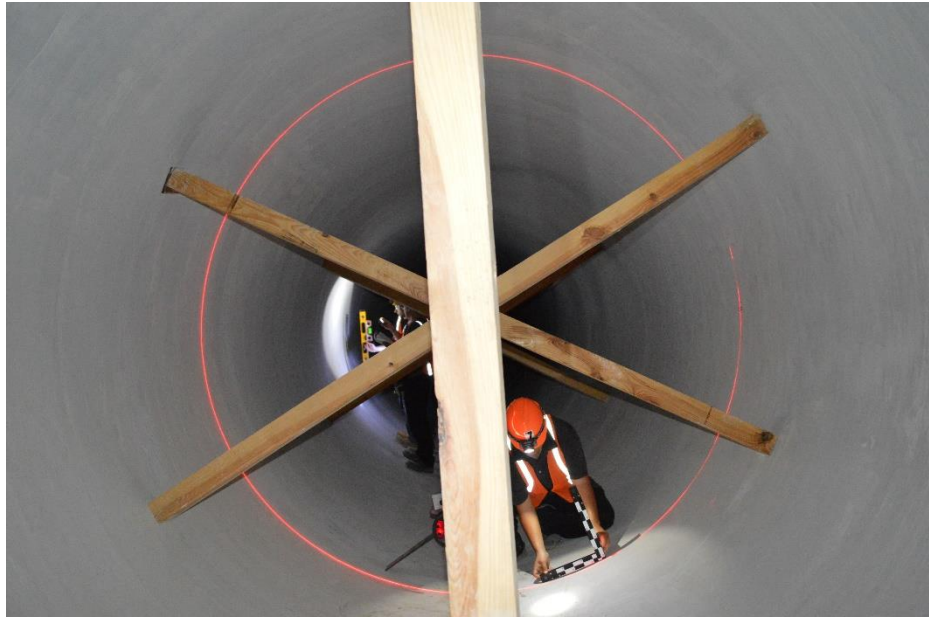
Laser photo profile method at 40ft of pipe joint number 1066 at placement
